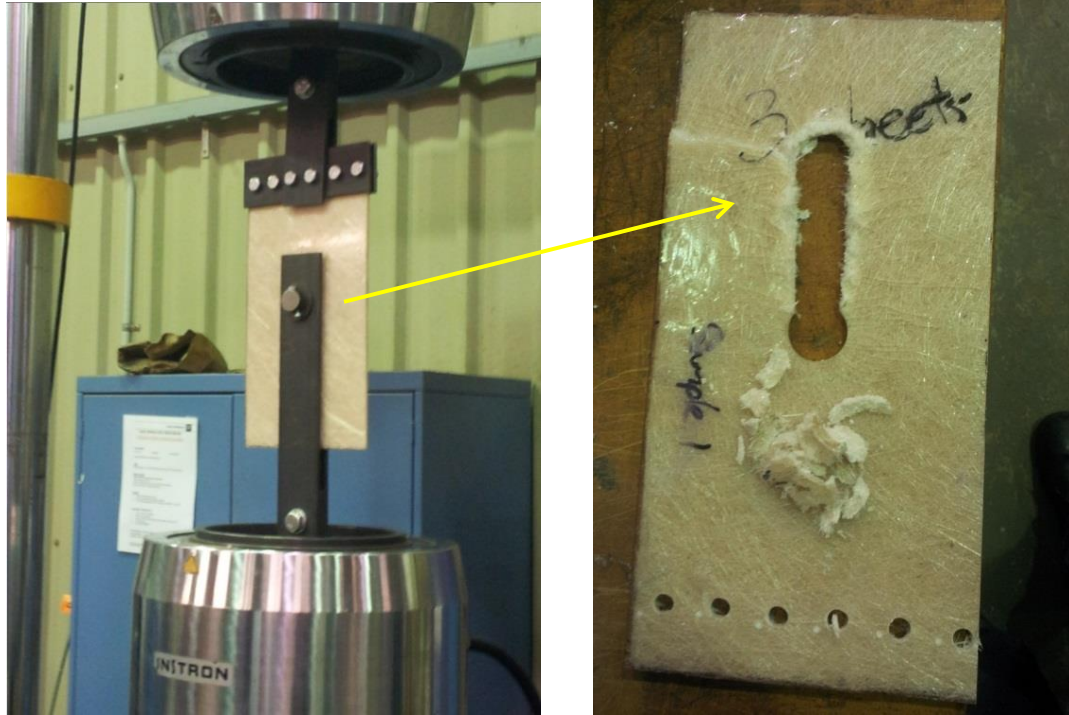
The polymer sheet with steel rock bolt clamped into the 500 kN Instron servo-hydraulic universal testing machine and torn apart (Nemcik *et al.* 2013a)
